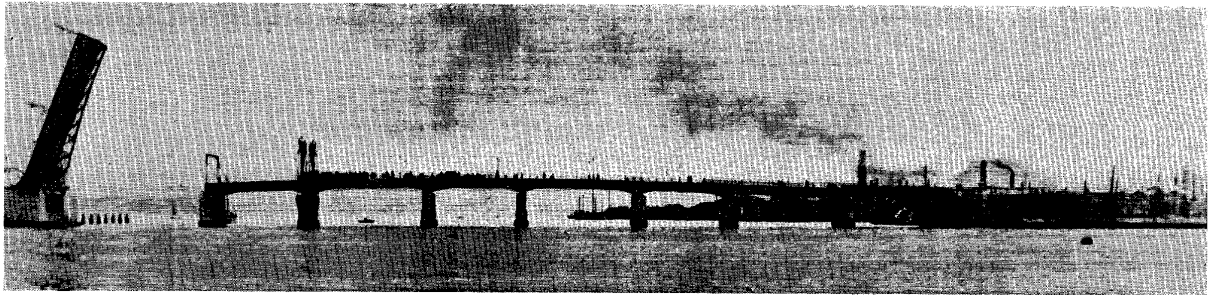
Pusan. Bridge connecting Pusan with Mok-to (Makino-tō). Bascule and deck girder bridge. Probably looking E. 1935.
